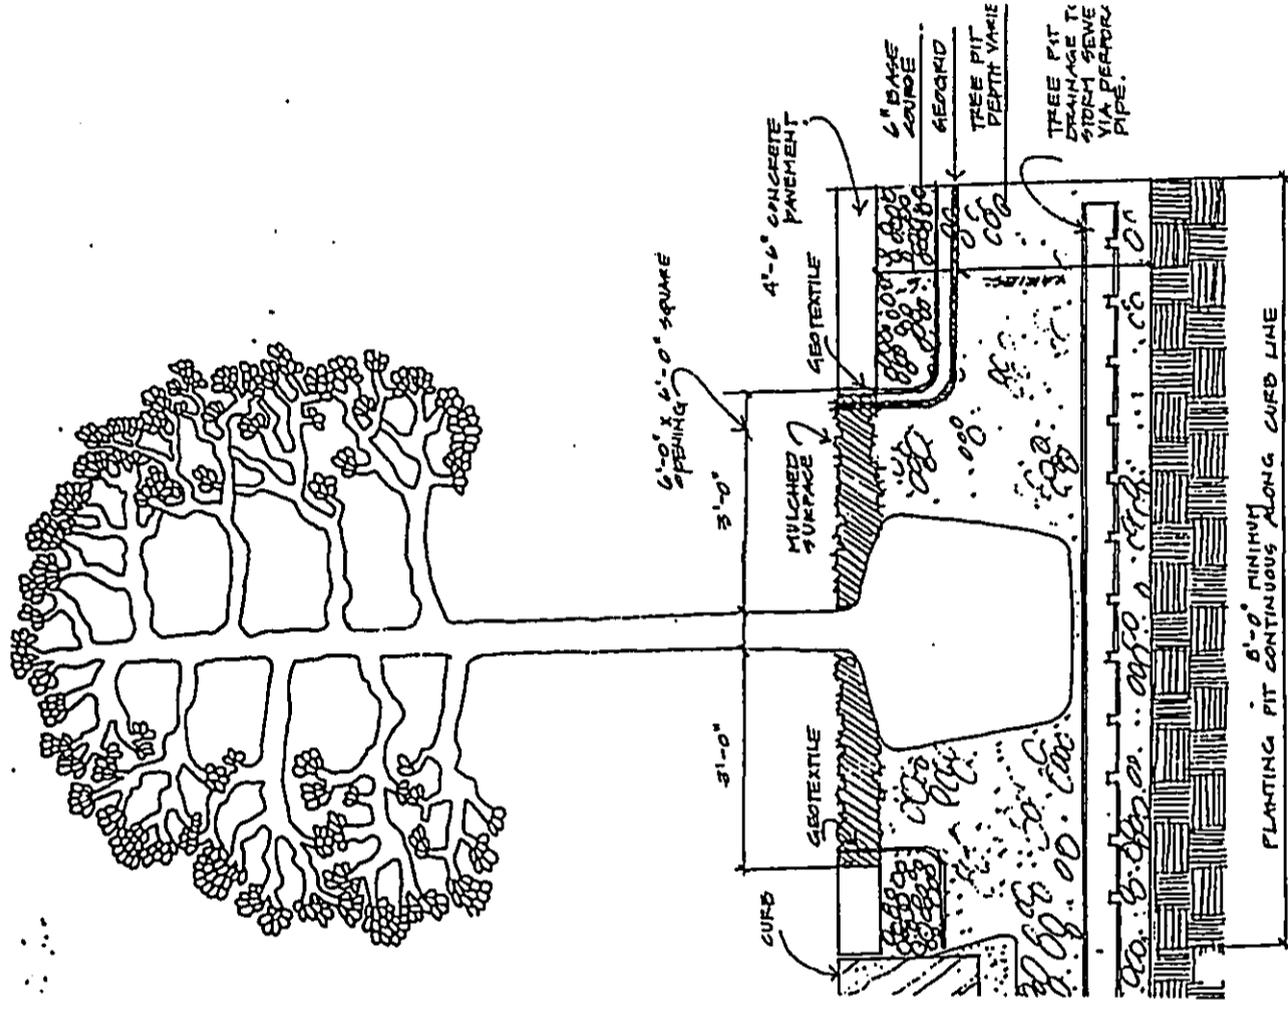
Elevation plan of a proposed structural soil pavement profile using the sub-base as the rooting zone.
